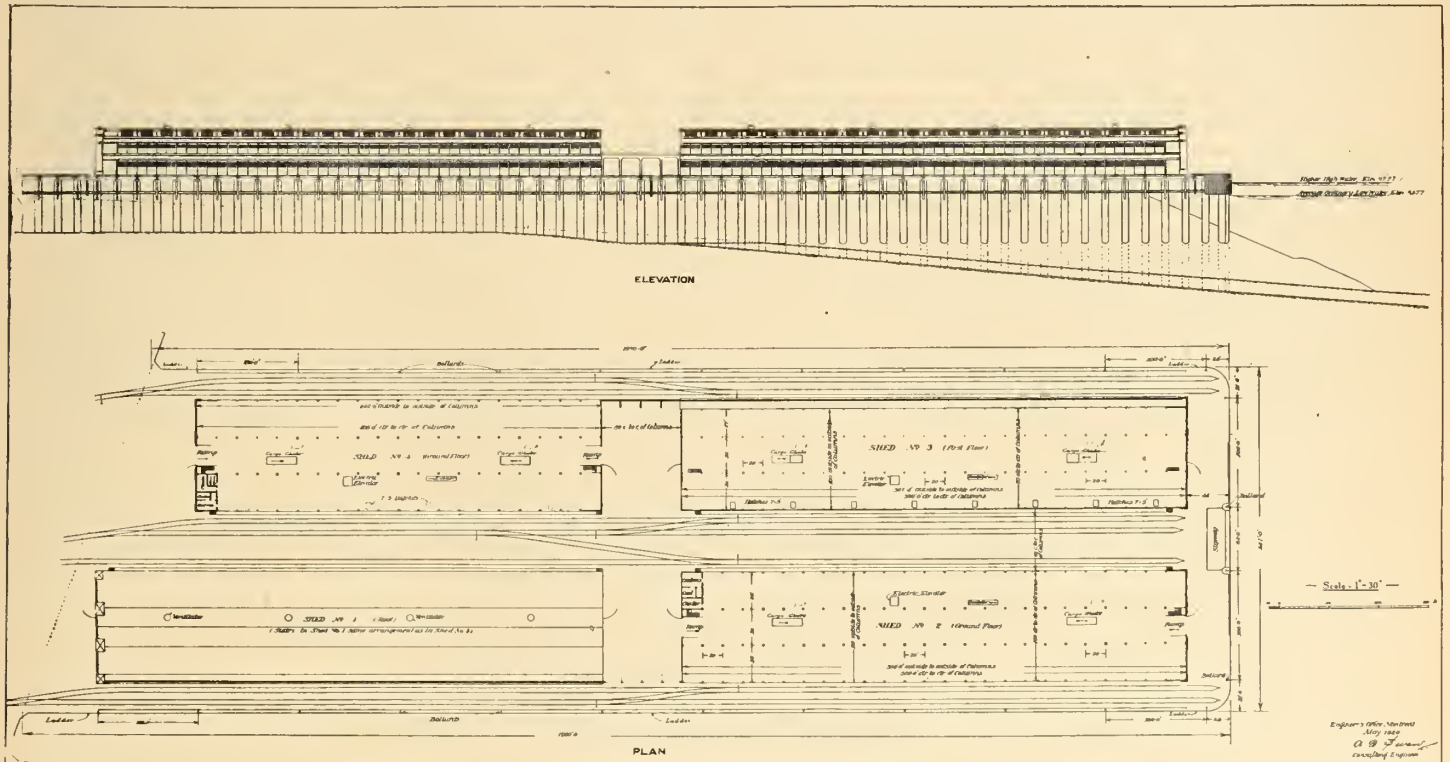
Ballantyne Pier — Plan and Elevation.
